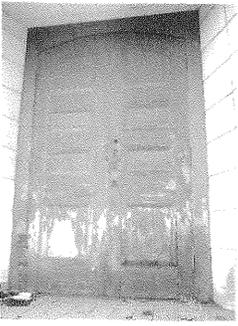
Double front doors on South West corner of Huron St. Peeling paint, damaged and or rotten wood, and missing hardware.
